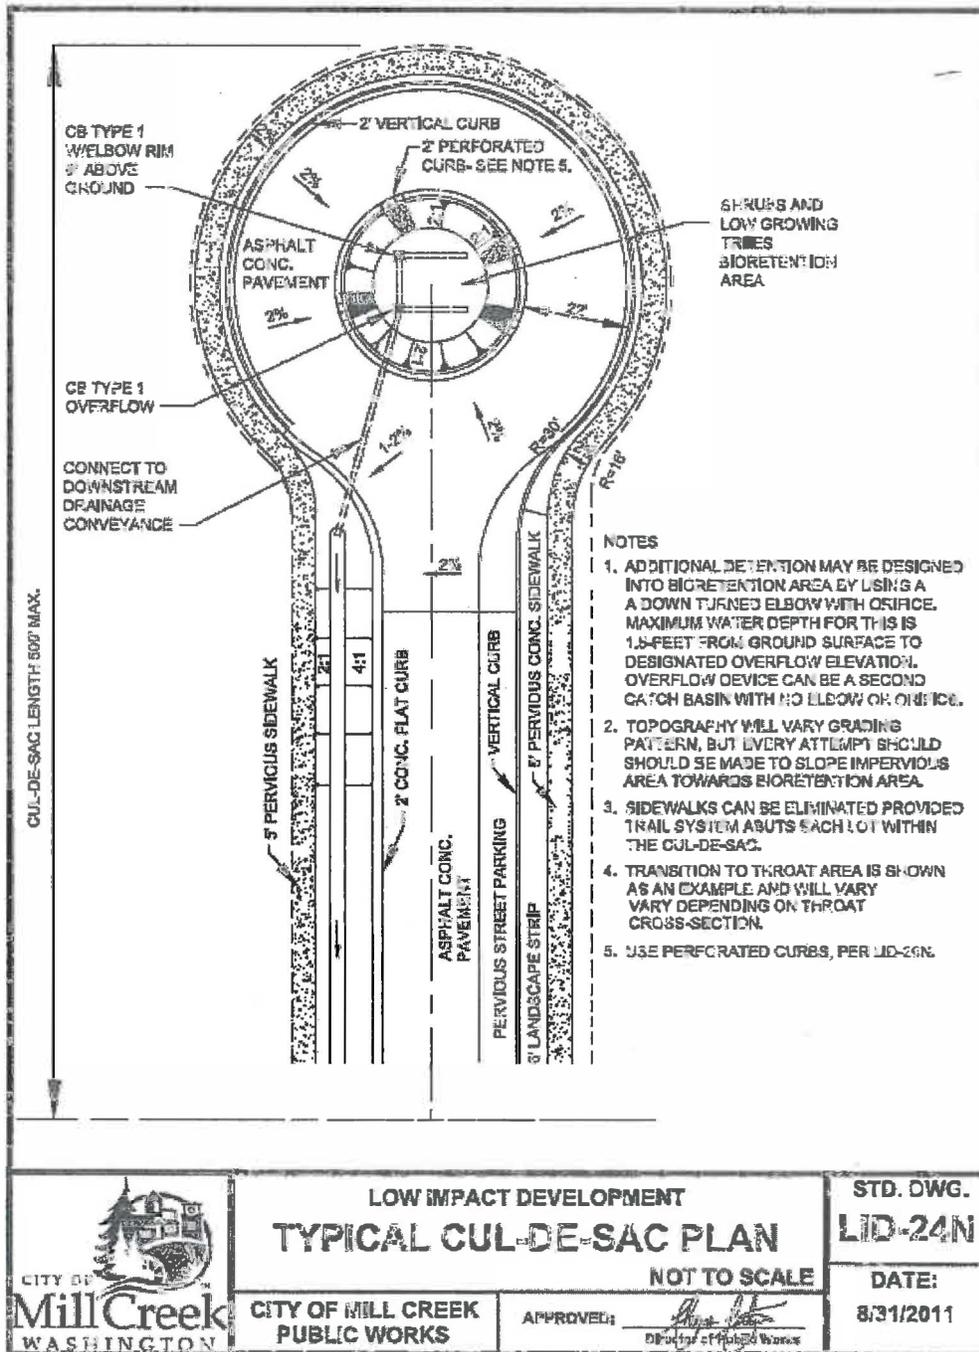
Mill Creek Typical Cul-de-Sac Plan
